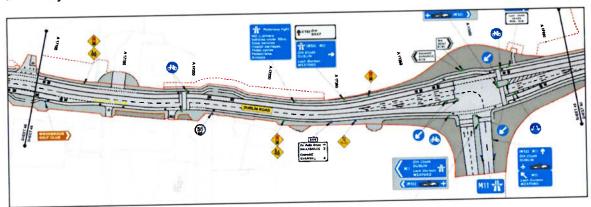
Extract of the 'Traffic Signs and Road Markings' – Sheet 49; illustrating the replacement works for the roundabout and the proposed road markings.
